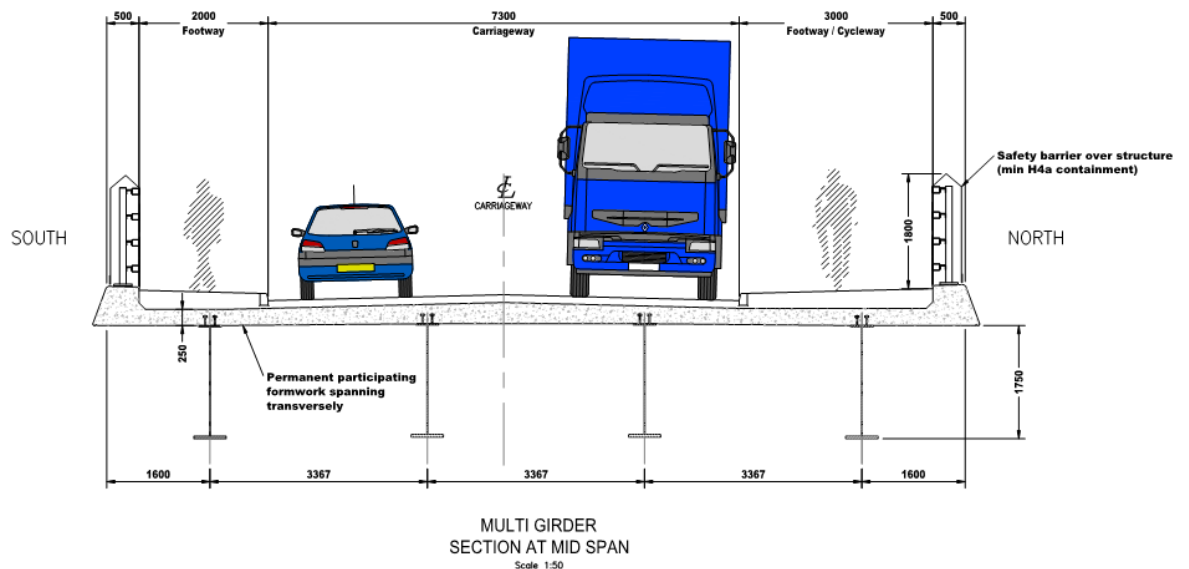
Preferred Route Alignment Cross Section on SLRB (Multi Girder Type)
